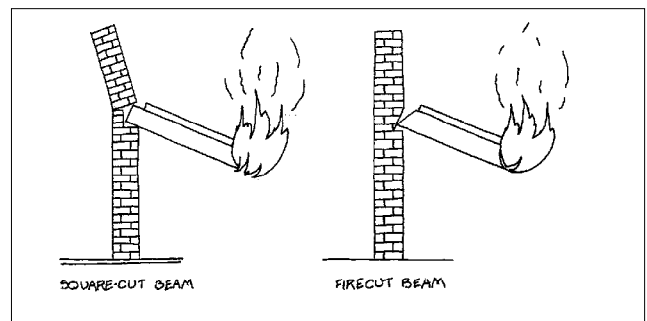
A 45 degree cut in the end of a beam will allow it to fall out of a masonry wall without toppling the wall. Firecutting is recommended in all masonry construction. See detail above for an example of firecutting in a masonry block wall.
